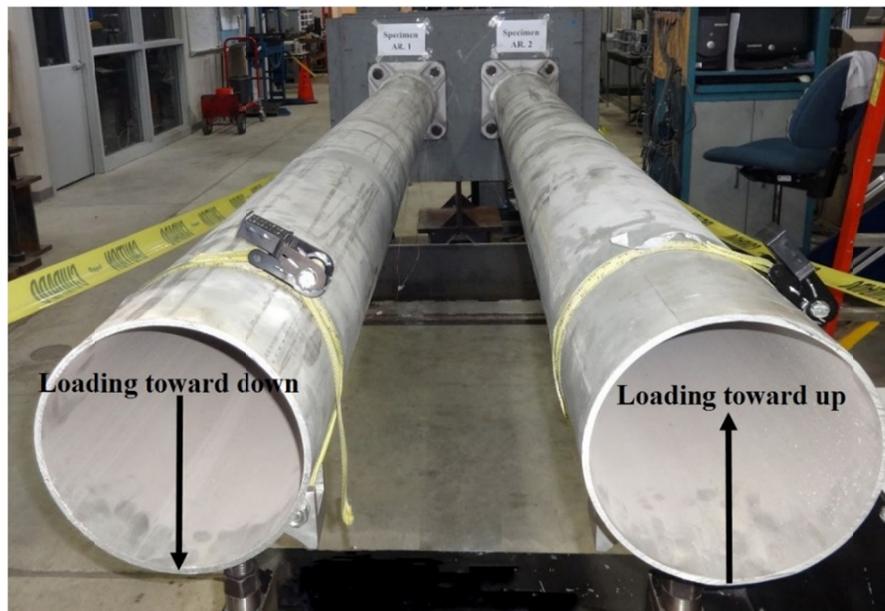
Fatigue testing device for two specimens together. (Photograph courtesy of testing engines and structures center, The University of Akron, Akron, OH)
